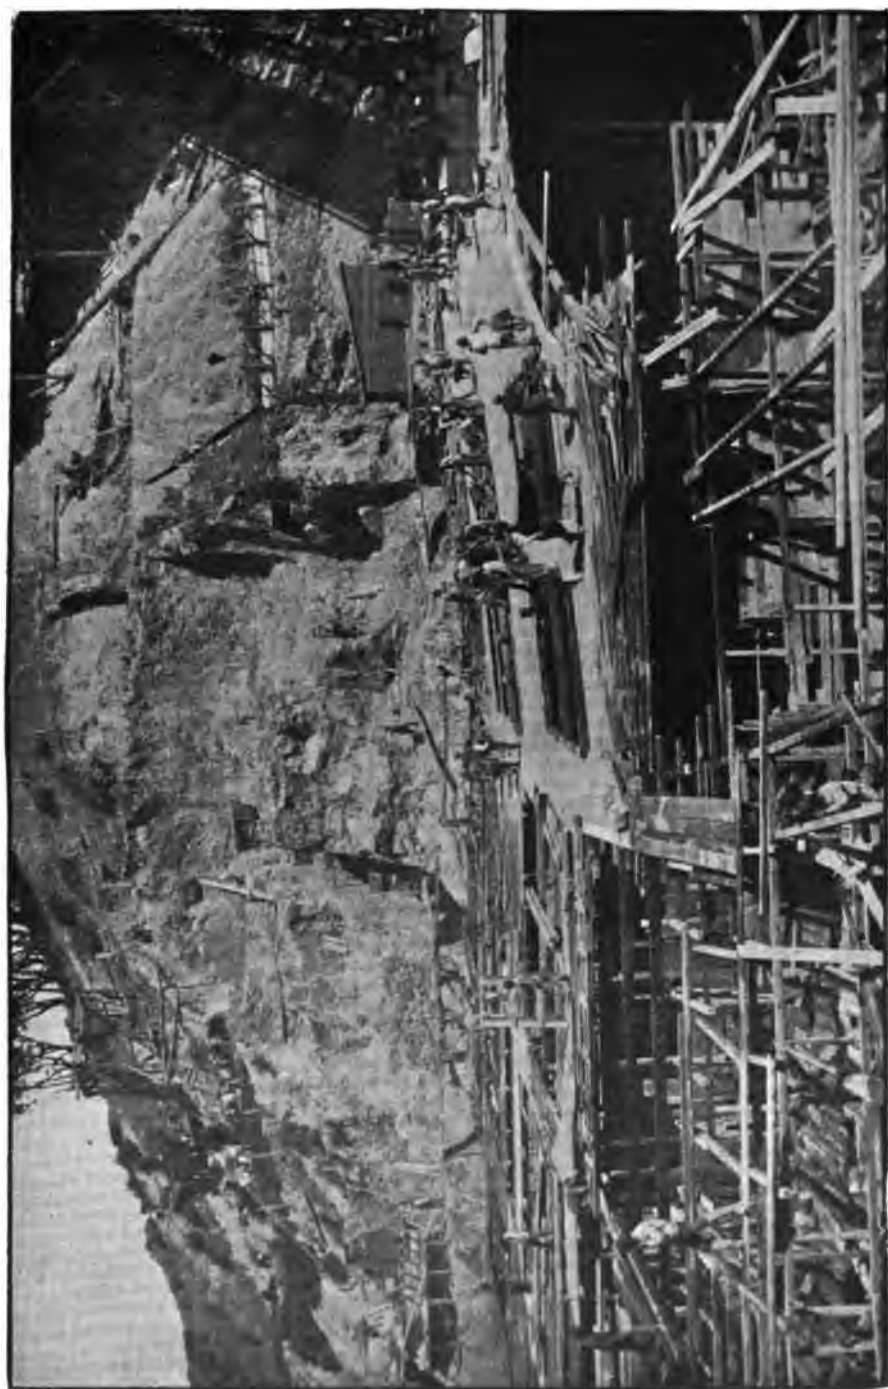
MOULDS FOR CONCRETE BLOCKS, SAN MATEO DAM.
